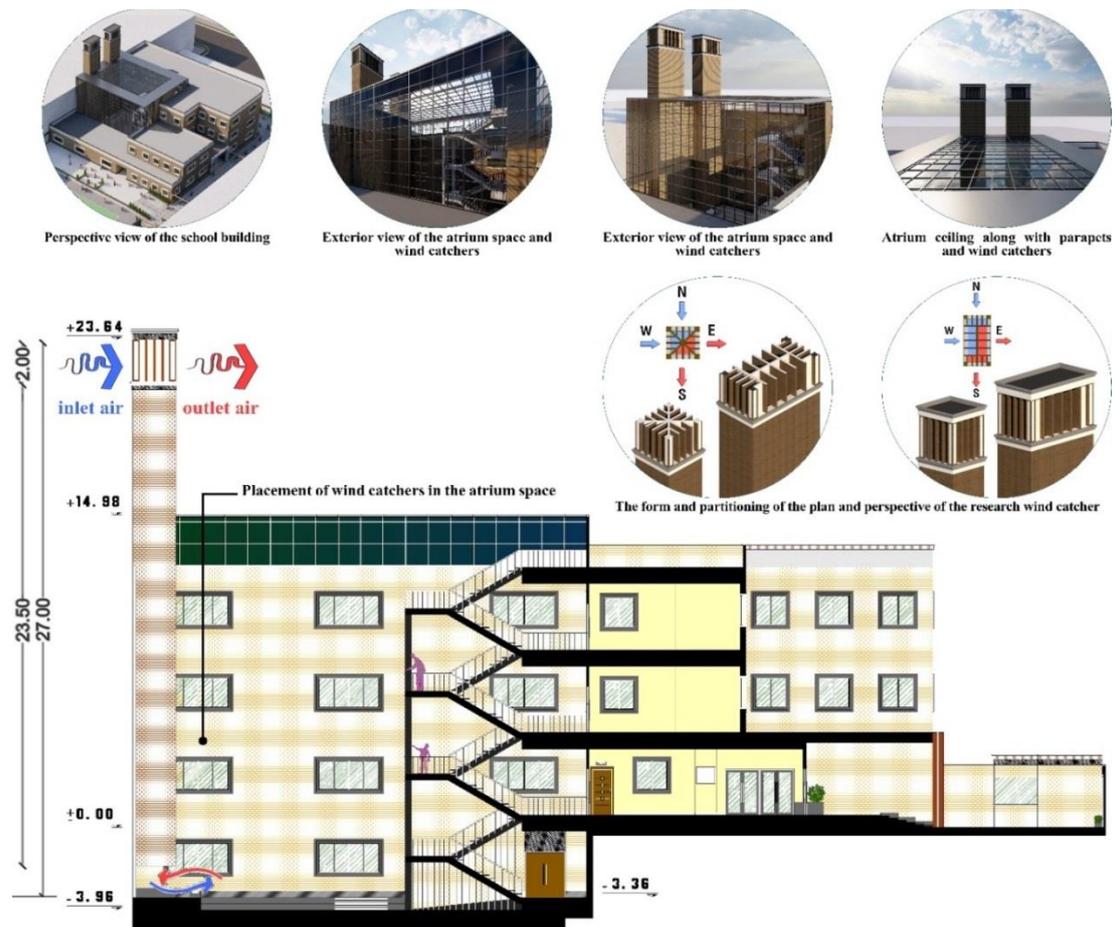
Section A-A of the school building and the connection between the air duct and the atrium space within it.
